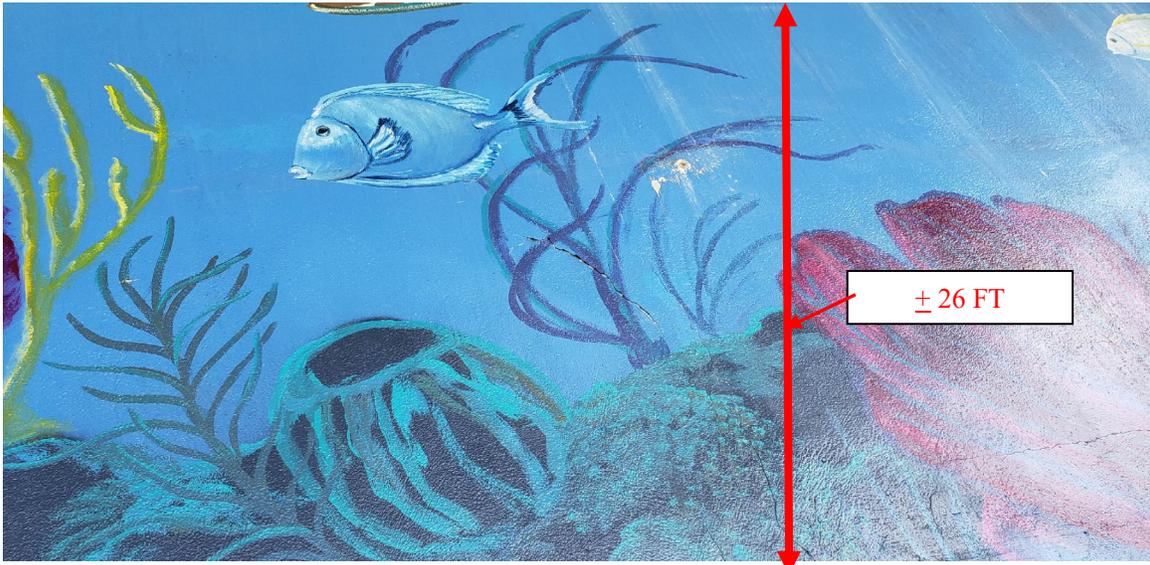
Location 11: Approximately 26 ft long new 12x16 concrete column.
